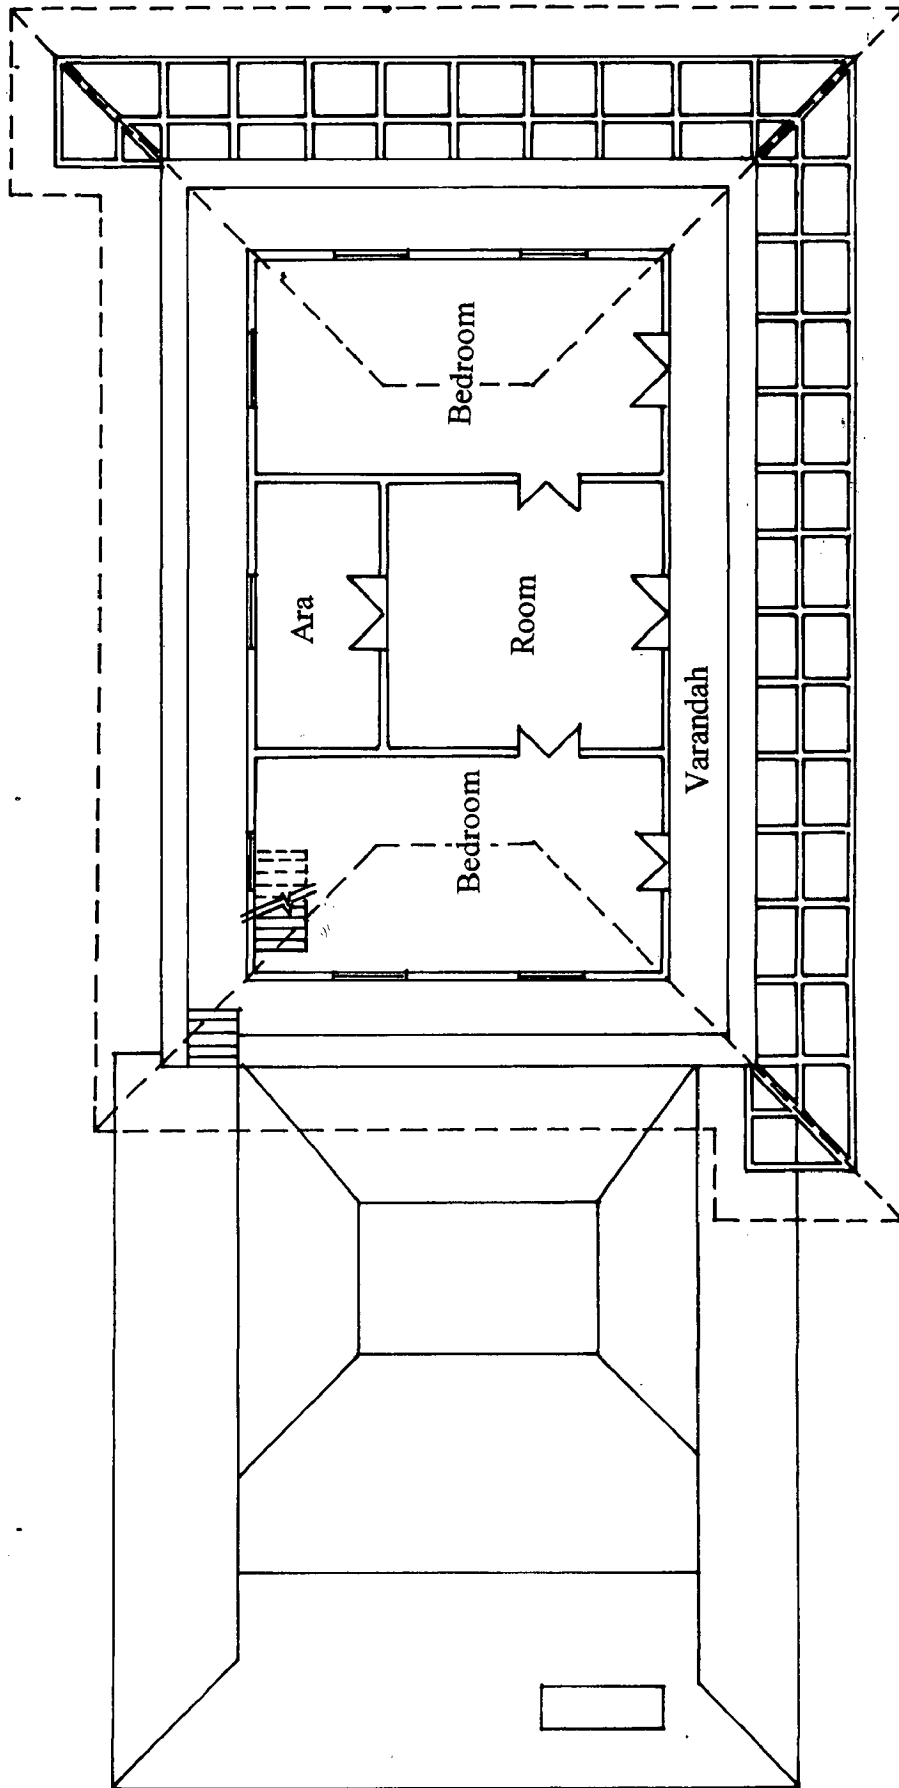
First Floor Plan: *Medayil House*, Scale 1:100
